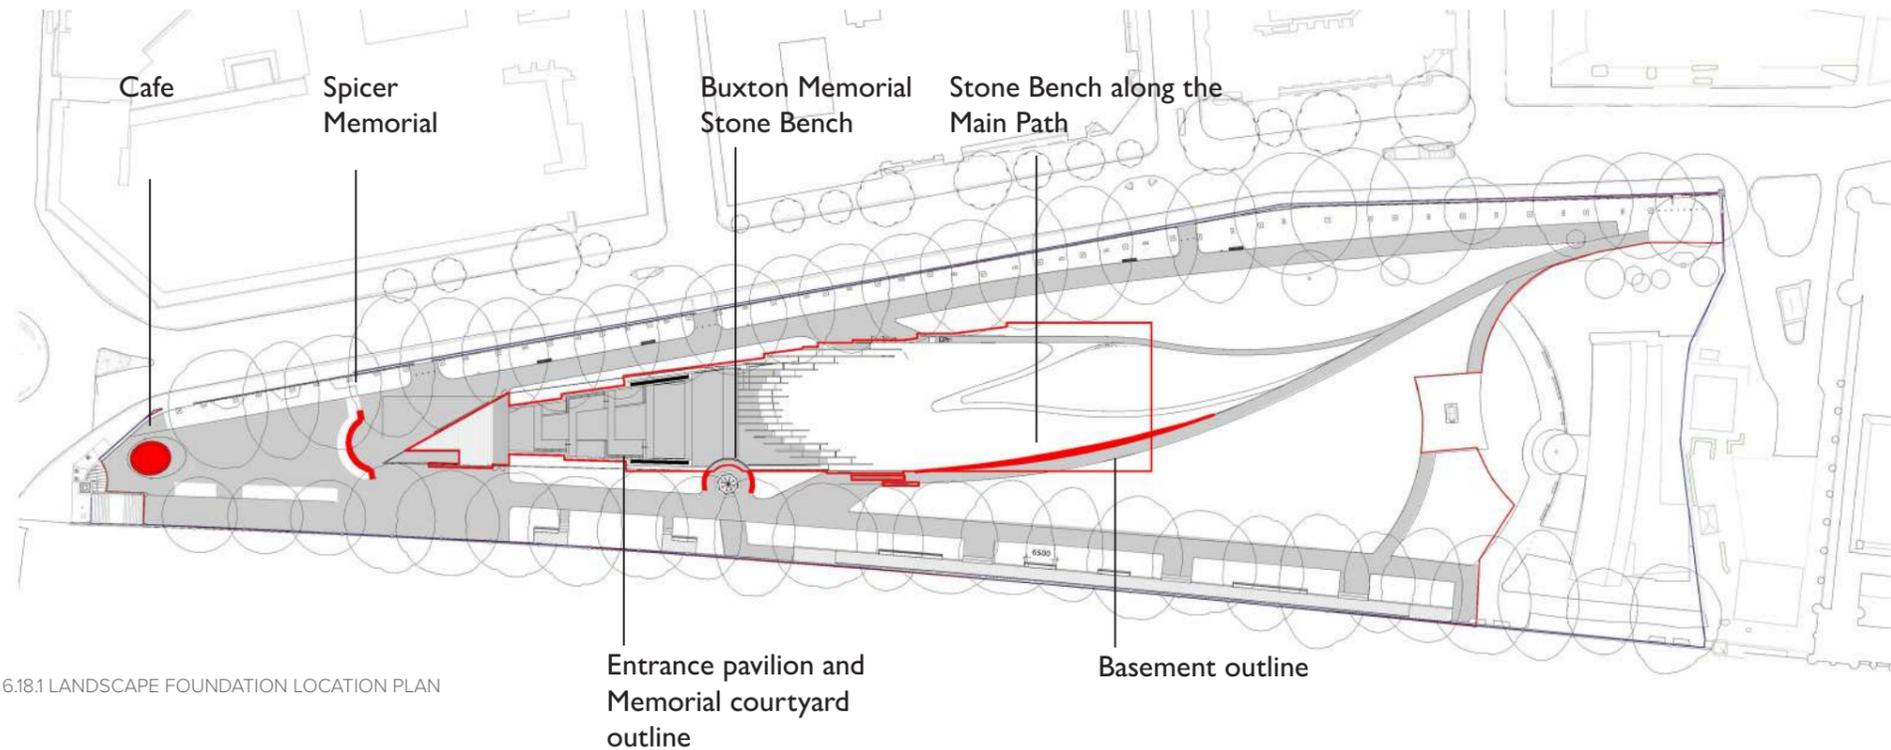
LANDSCAPE FOUNDATION LOCATION PLAN
